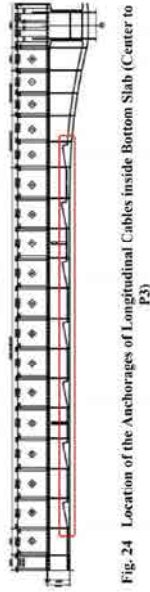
Location of the Anchorages of Longitudinal Cables inside Bottom Slab (Center to P3)
